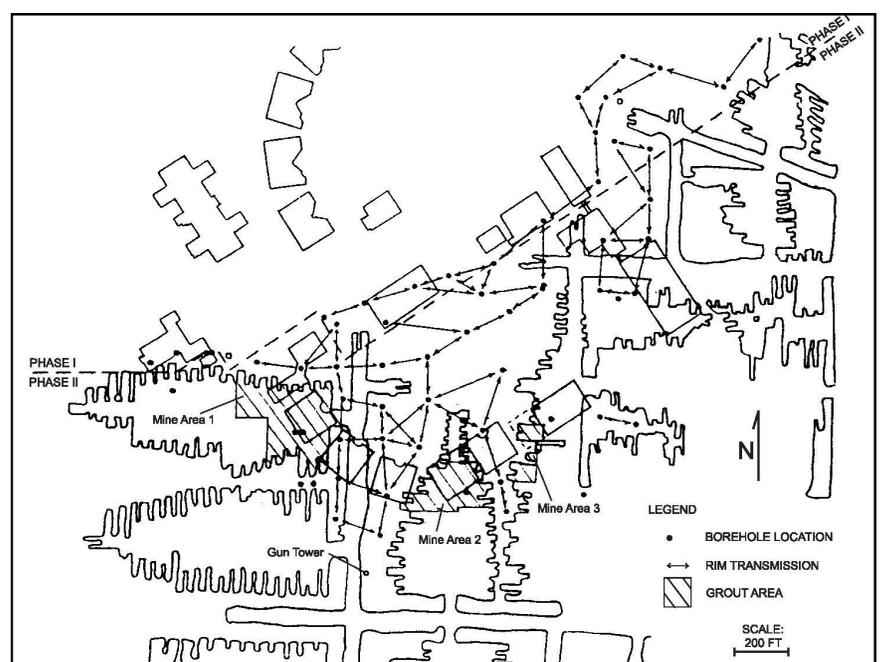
PLAN OF PHASE II CONSTRUCTION WITH OUTLINE OF MINING AND MINE AREAS THAT WERE GROUTED
